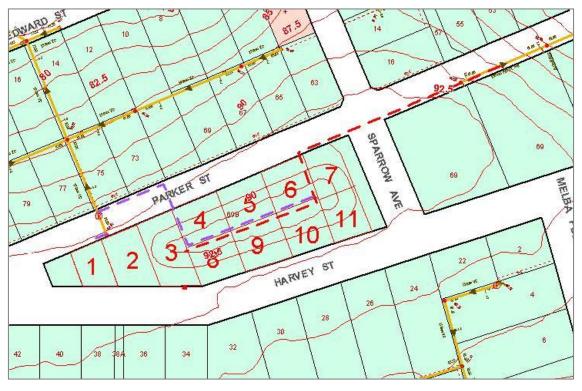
Proposed Barwon Water Sewer Layout (11 lot concept)
